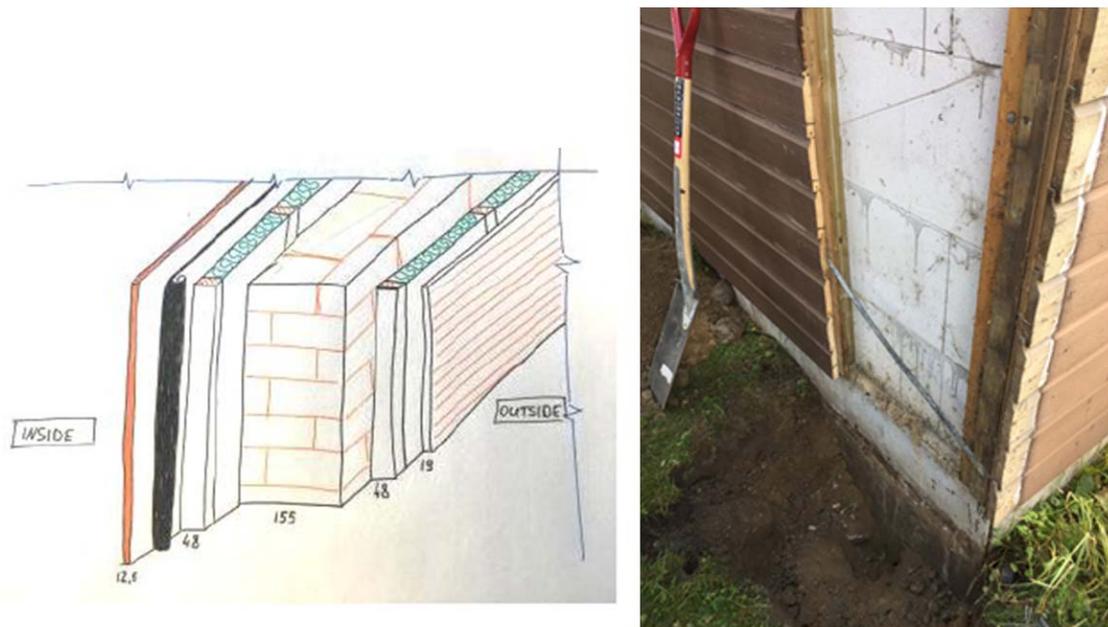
Inspection of existing construction. Early sketches of ground floor Siporex construction (top, left) and general wooden construction
